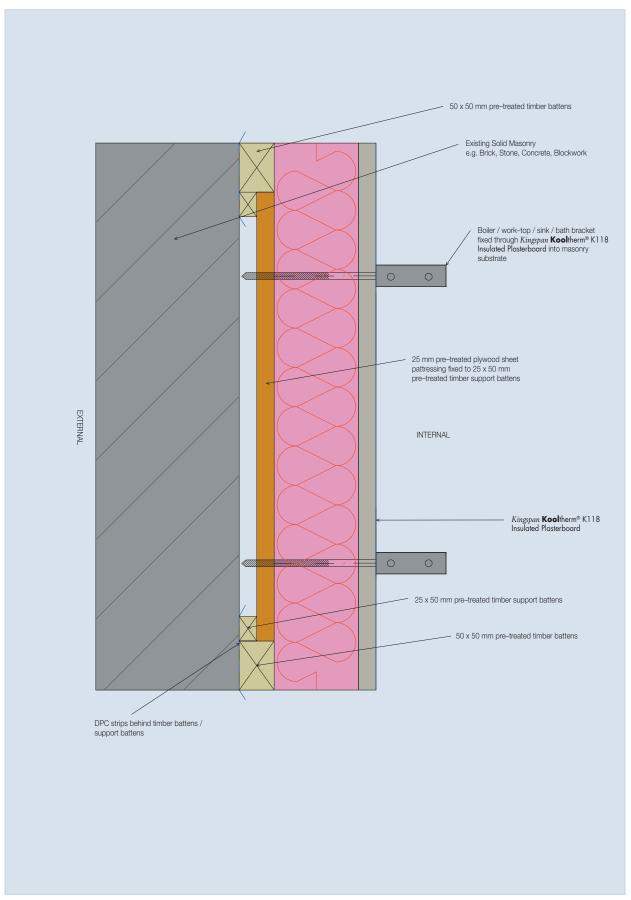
Heavy Surface Mounted Fittings Detail (Mechanically Fixed)
